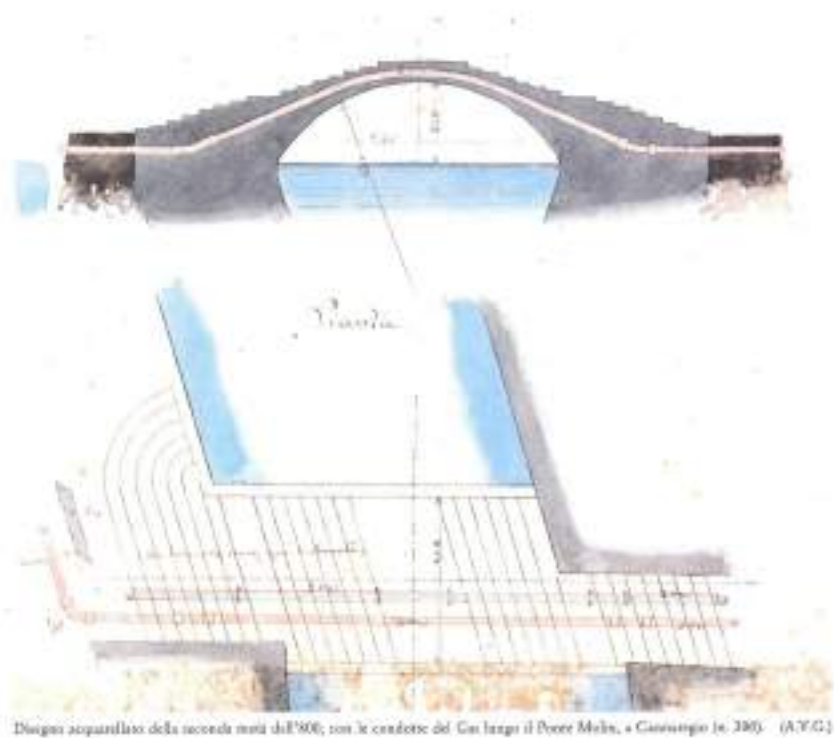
“Molin” bridge watercolour drawing on the second half of XIX century. Gas pipelines location
